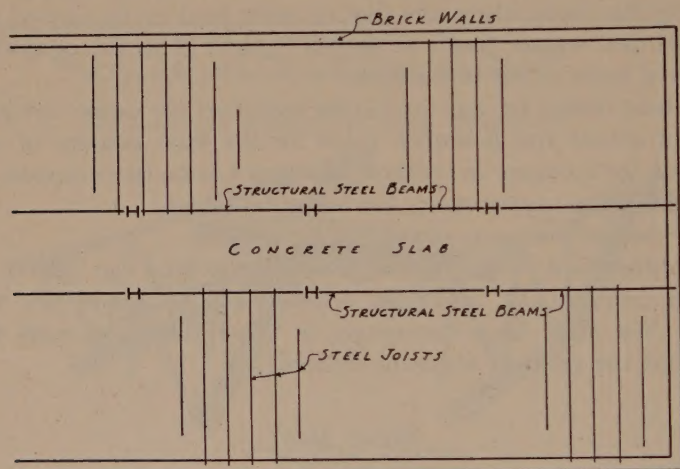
LAYOUT FOR SUPPORTS FOR STEEL JOISTS
